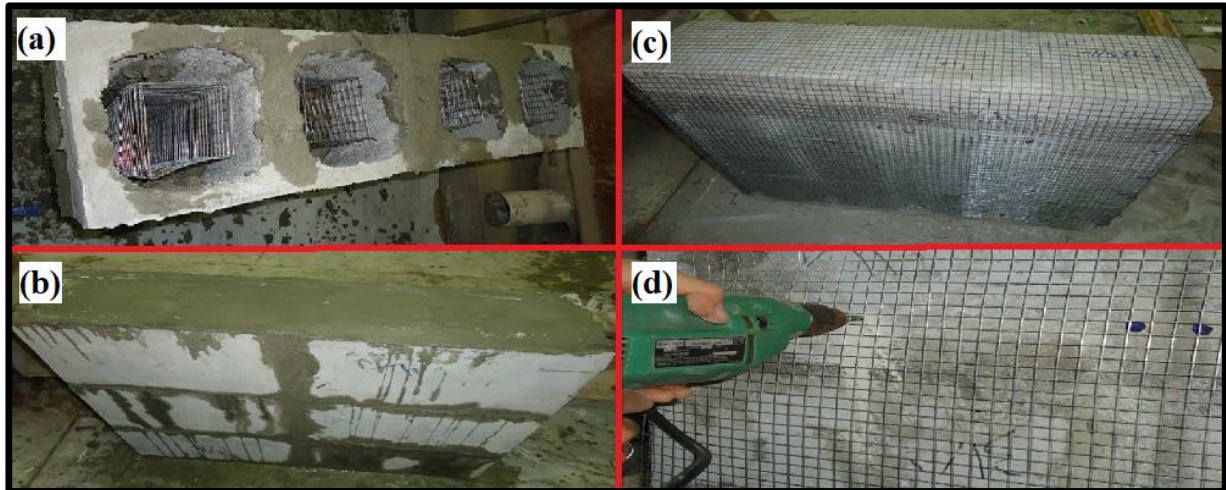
Reinforcement of a wall with ferrocement wire (a- Steel wire mesh box reinforcement arrangement inside the holes of walls specimens, b- Walls specimens after filling the holes by mortar, c- Drilling the holes for the connectors, d- Steel wire meshes after formed into cages and enwrapped) (Shaheen et al., 2018)
